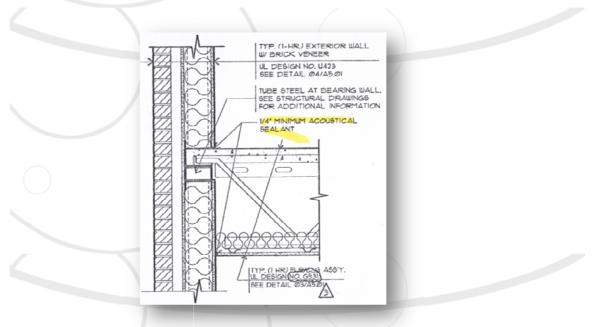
Typical 1- HR Exterior Wall with Brick Veneer
